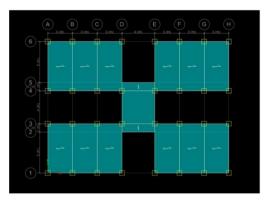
Plan of G+30 story CFST building (22 m x 16 m)
